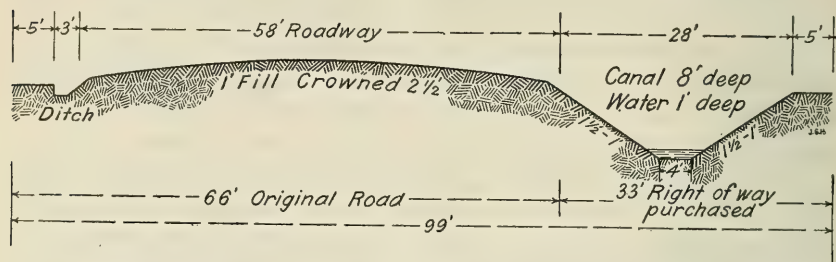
Illustrating how a canal may be built along a 4-rod road by purchasing a 2-rod right of way and placing all the spoil on the road.
